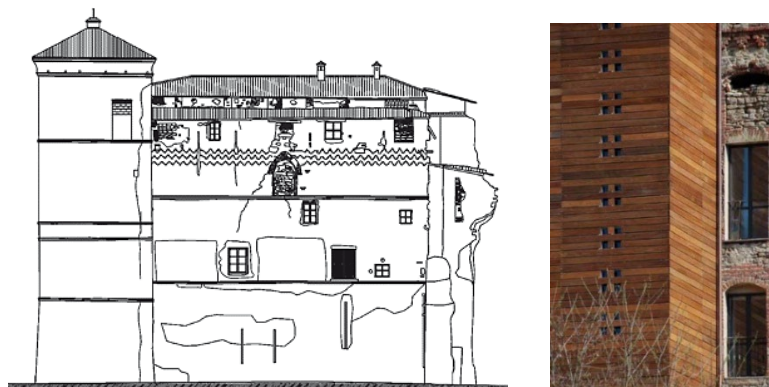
Saliceto Castle, Cuneo, Italy: a. East elevation, state of the places, b. Detail of technological tower reconstruction. [16]
